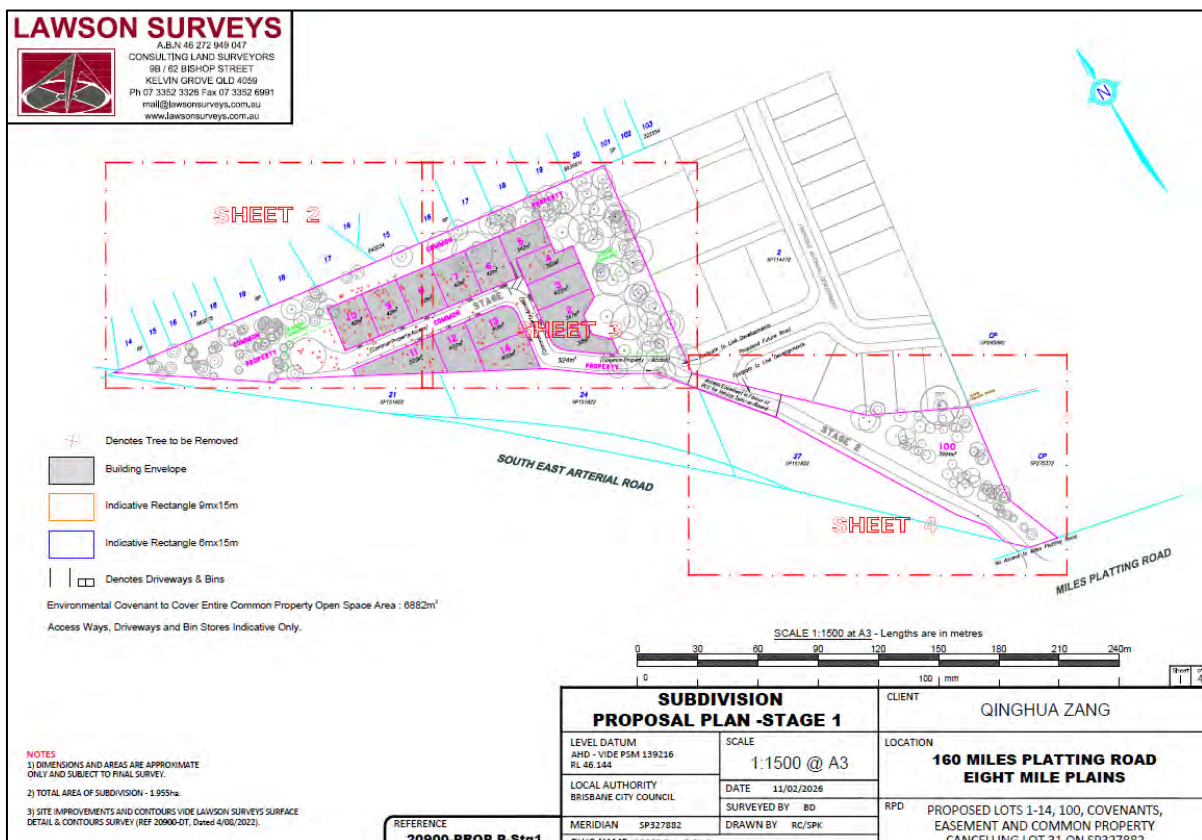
Subdivision Proposal Plan – Stage 1 (20900-PROP.L-Stg1 date: 11/02/26)
